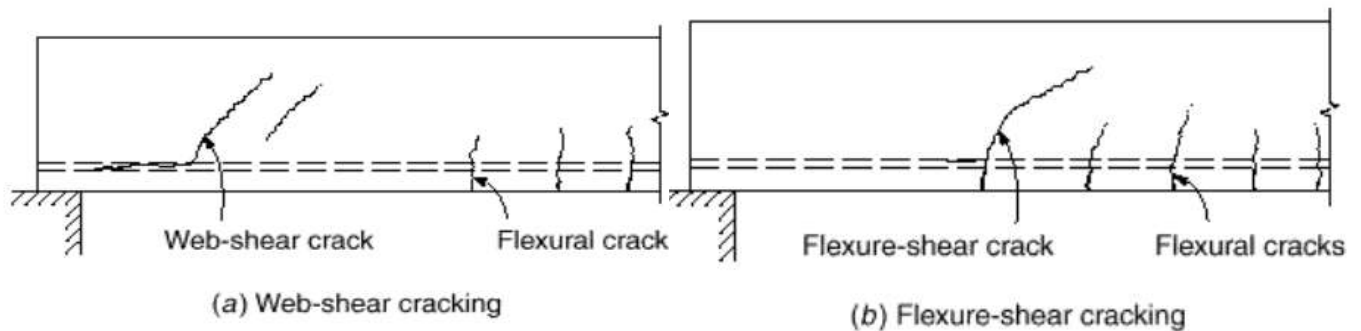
shear cracking in Reinforced Concrete beams [6]
